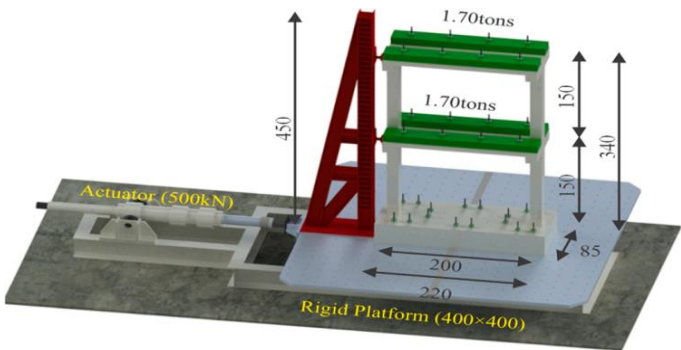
Dimensions of the test setup (dimensions in cm) ^[129].
